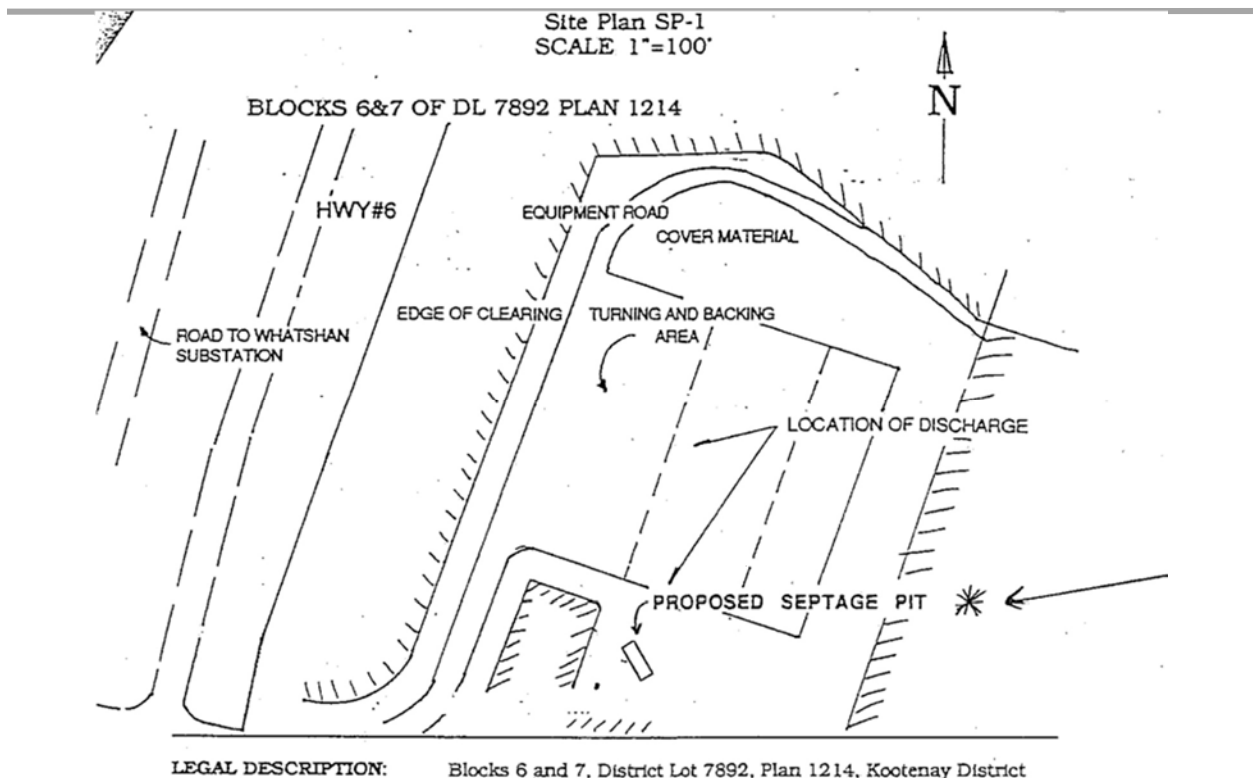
Site Plan From 1992 Amended Permit PR-04366
